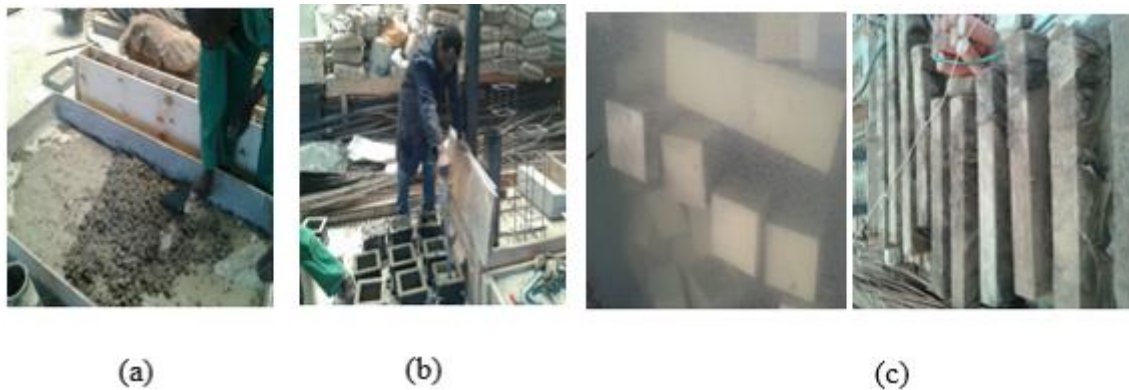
Procedures for (a) mixing, (b) placement and (c) curing of concrete
